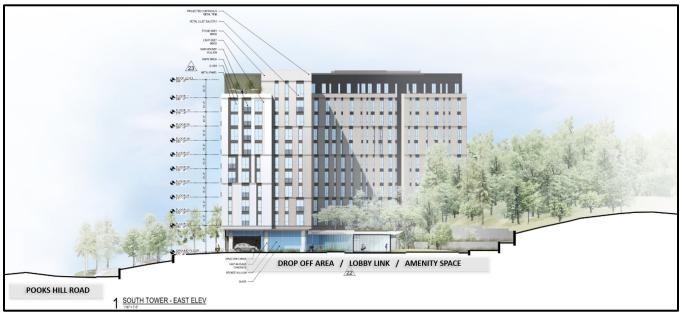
Section looking towards the South Tower showing amenity space and rear topography
